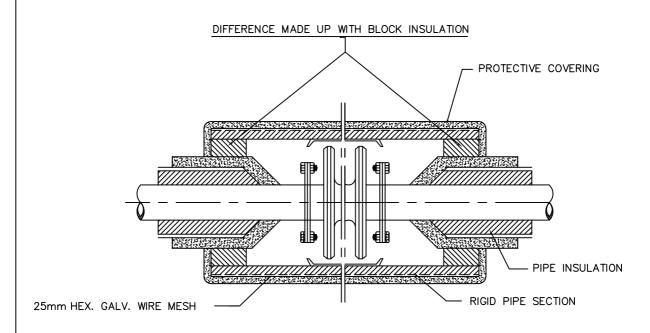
EXPANSION JOINTS FOR BLANKET INSULATION
